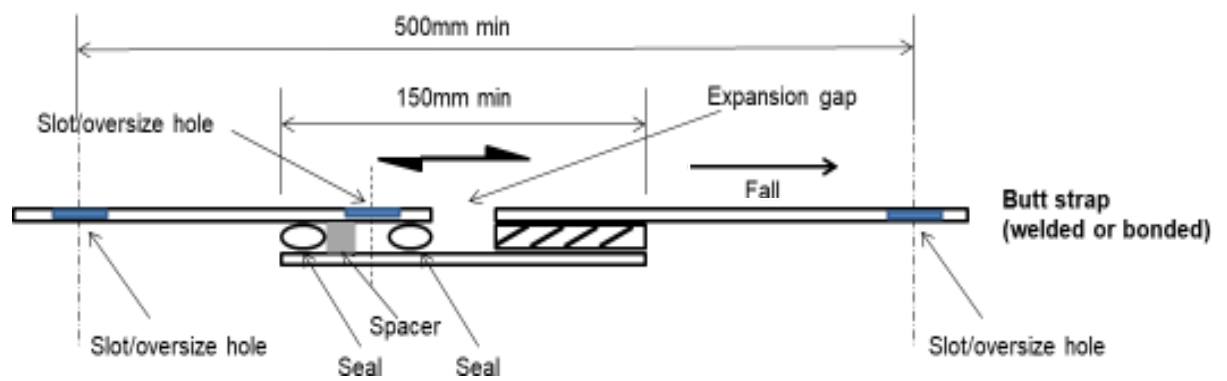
Floating fix and welded or bonded arrangement across butt strap
